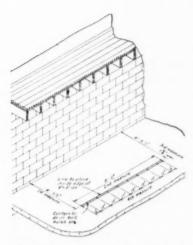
Method of measuring and marking holes in basement concrete floor for wooden lean-to
